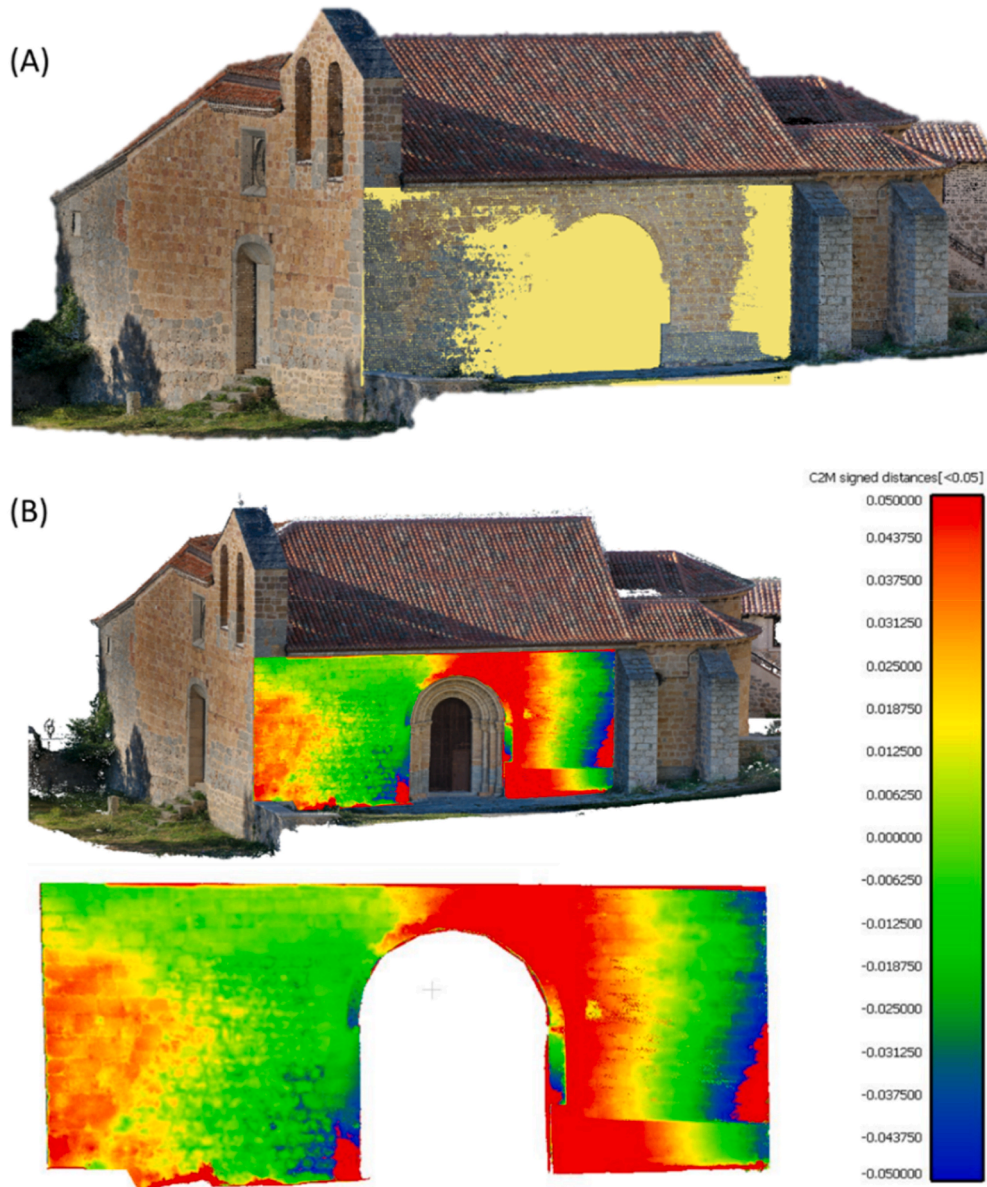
(a) Plan that best fits the wall of the south façade. (b) Image of façade flatness analysis.
